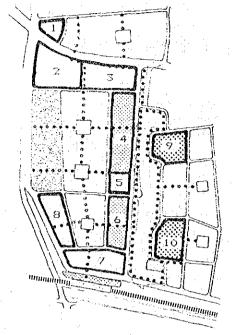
BLDG. CONSTRUCTION SITE LAYOUT
